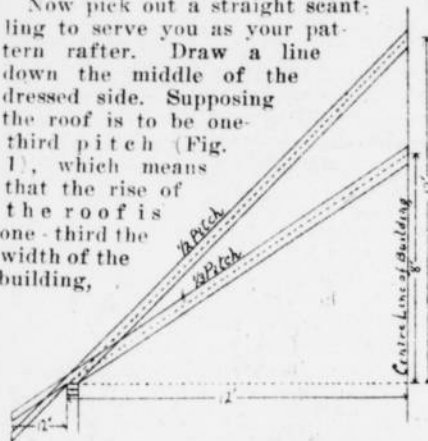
Rafters for half and third pitch, 24-foot building.
